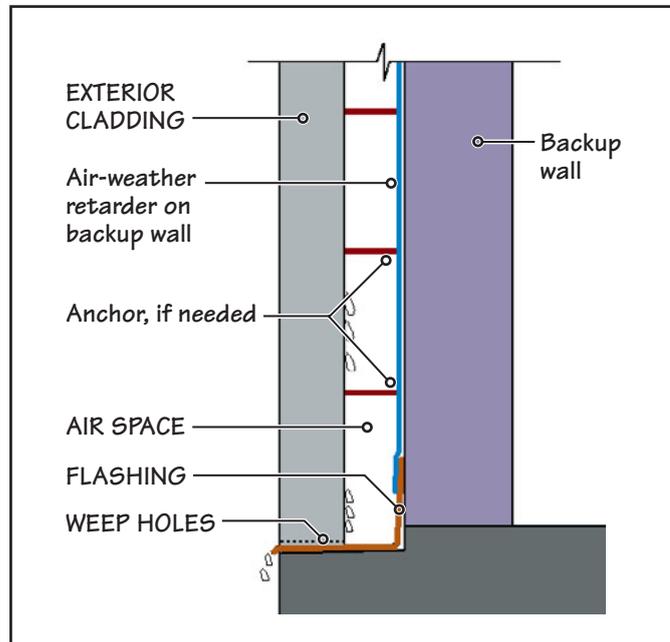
A section through a drainage wall showing its important water infiltration control features. (Note that the air space in a drainage wall may also have insulation, which is not part of water infiltration control.)
